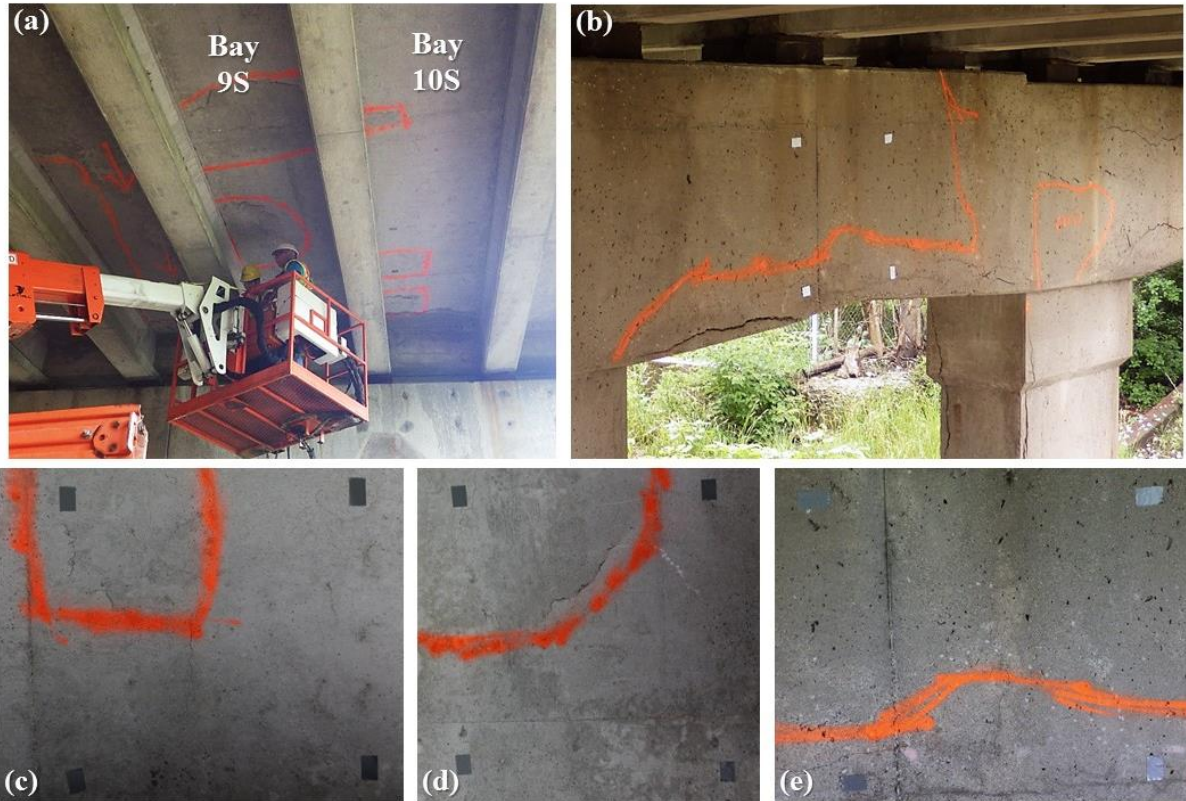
(a) Underside of the Franklin Street Bridge Deck. (b) Delamination on Pier 22. (c) Test Location A: Underside of Bridge Deck in Bay 10S. (d) Test Location B: Underside of Bridge Deck in Bay 9S. (e) Test Location C: Pier Cap of Pier 22.
